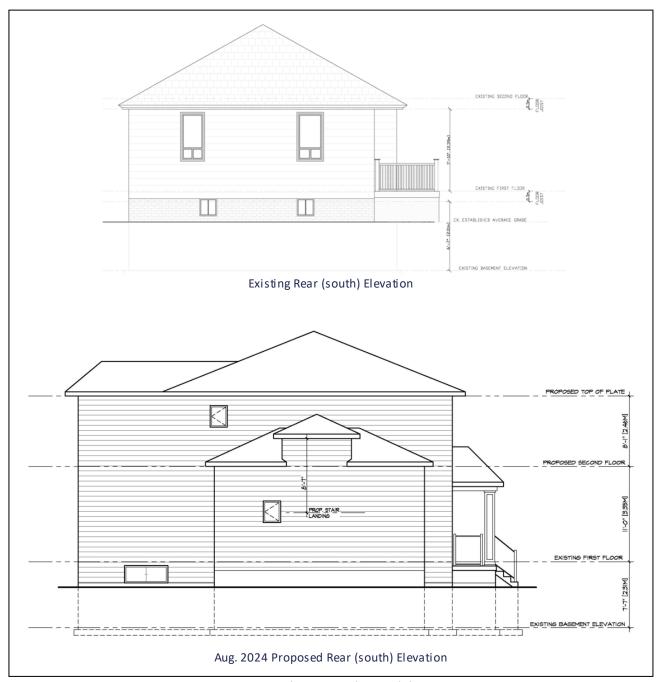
Existing elevation and original design concept (Blue Grove Engineering Group Inc., Aug. 2024)
